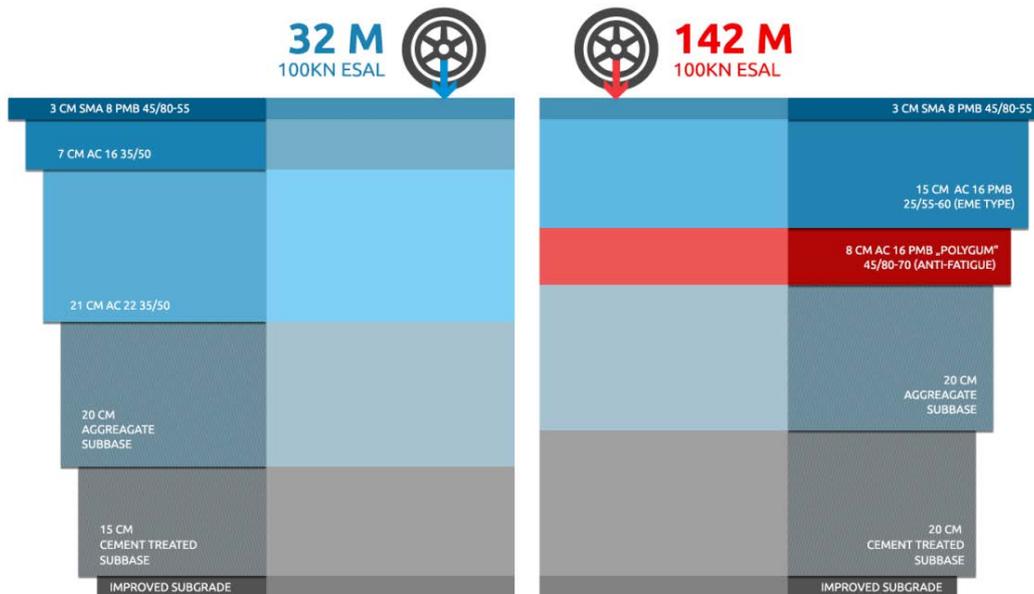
Traditional pavements structure, tendered on S8 expressway Opacz – Janki (left) and proposed alternative perpetual asphalt pavement (right), constructed in 2015
